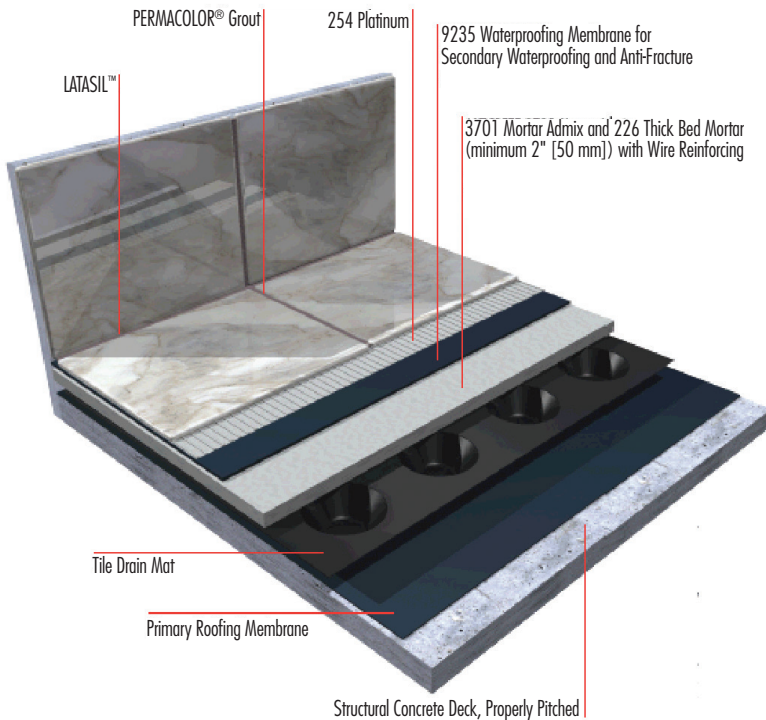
LATICRETE International, Inc. — LATICRETE Plaza & Deck System for exterior applications over occupied space.
